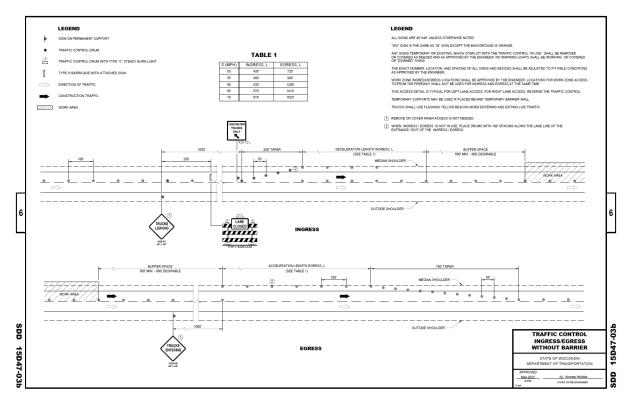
WisDOT Construction Access Point Drawing 15D47-03b (45).
